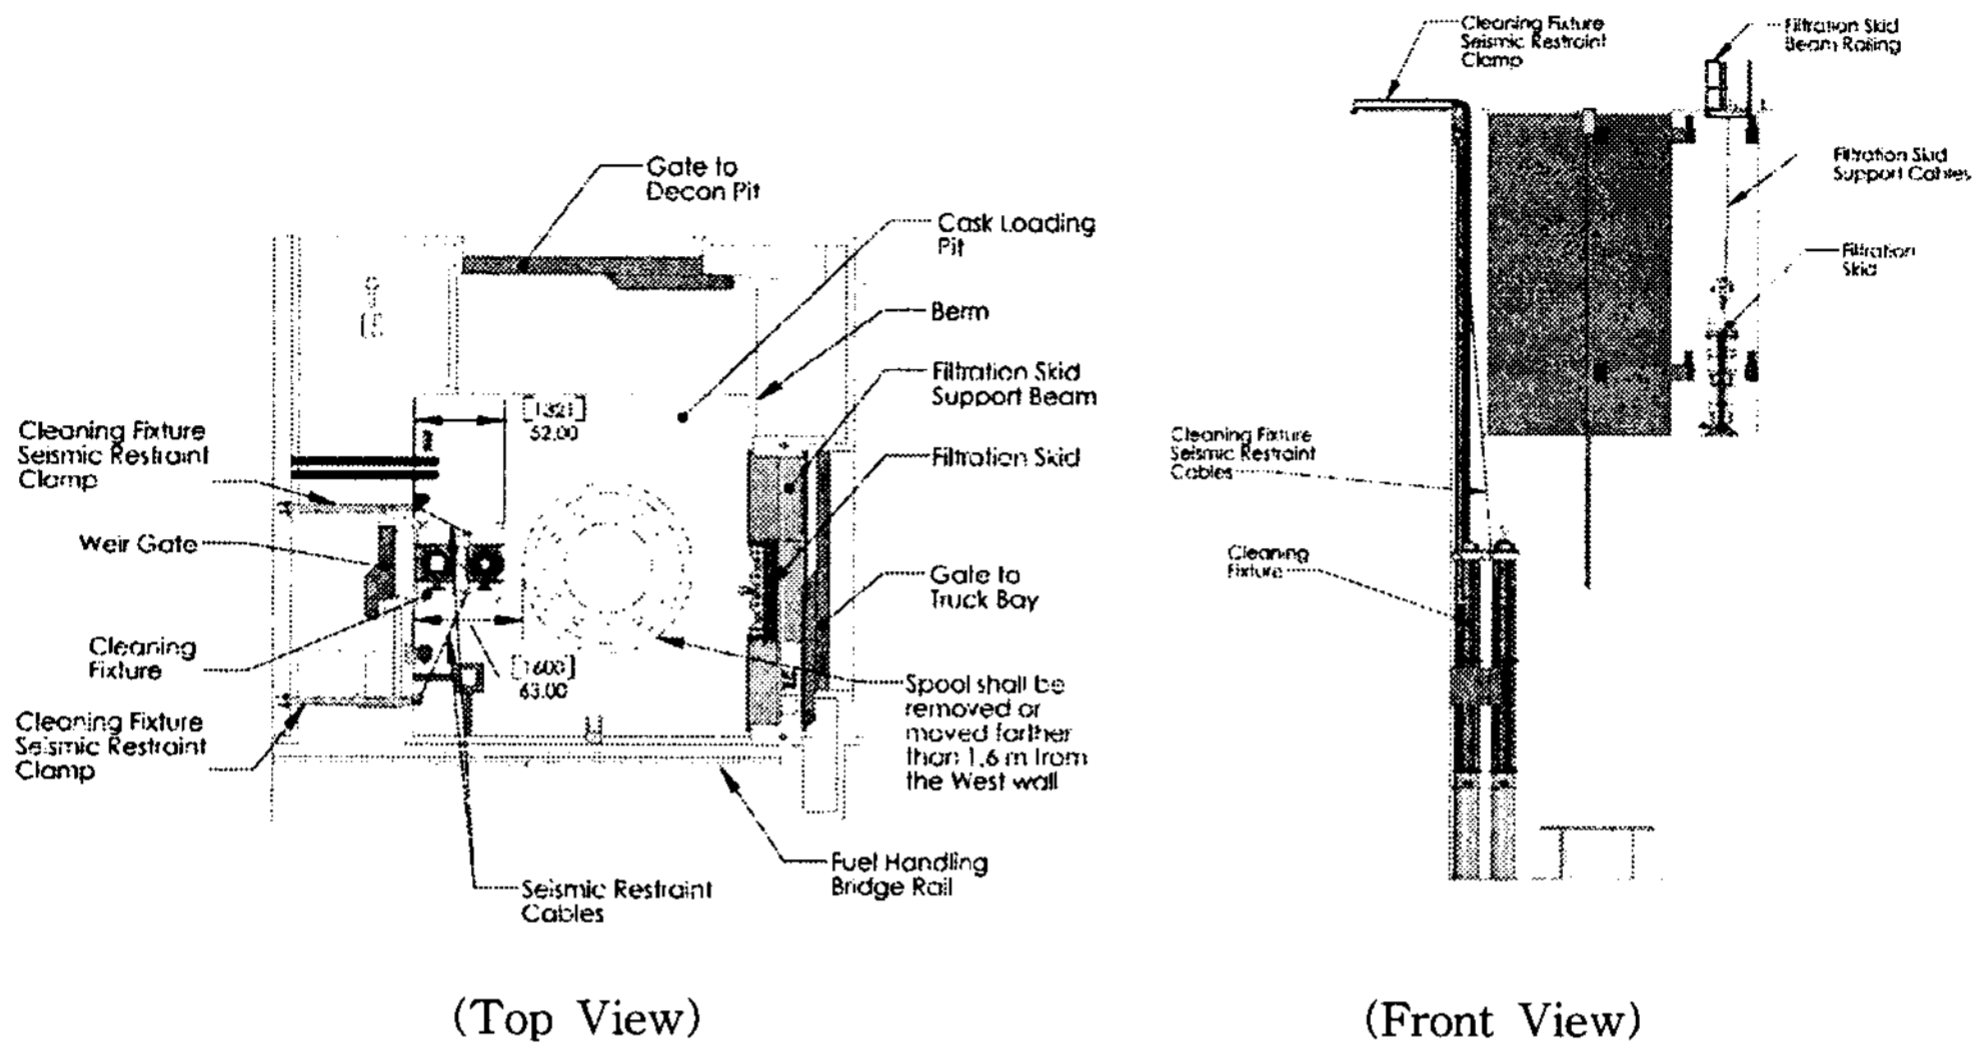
UFC Equipment Installation in YGN-1 Cask Loading Pit
